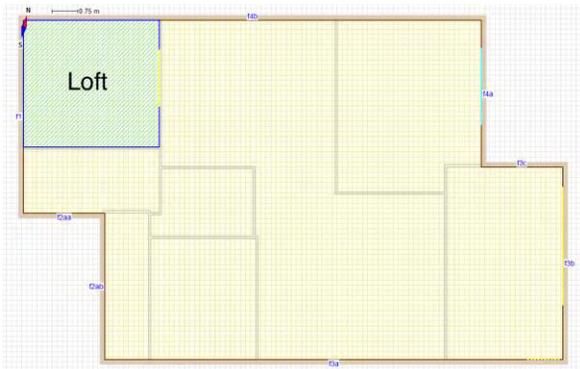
LIVING LAB LAYOUT ARCHITECTURAL DRAWING.
